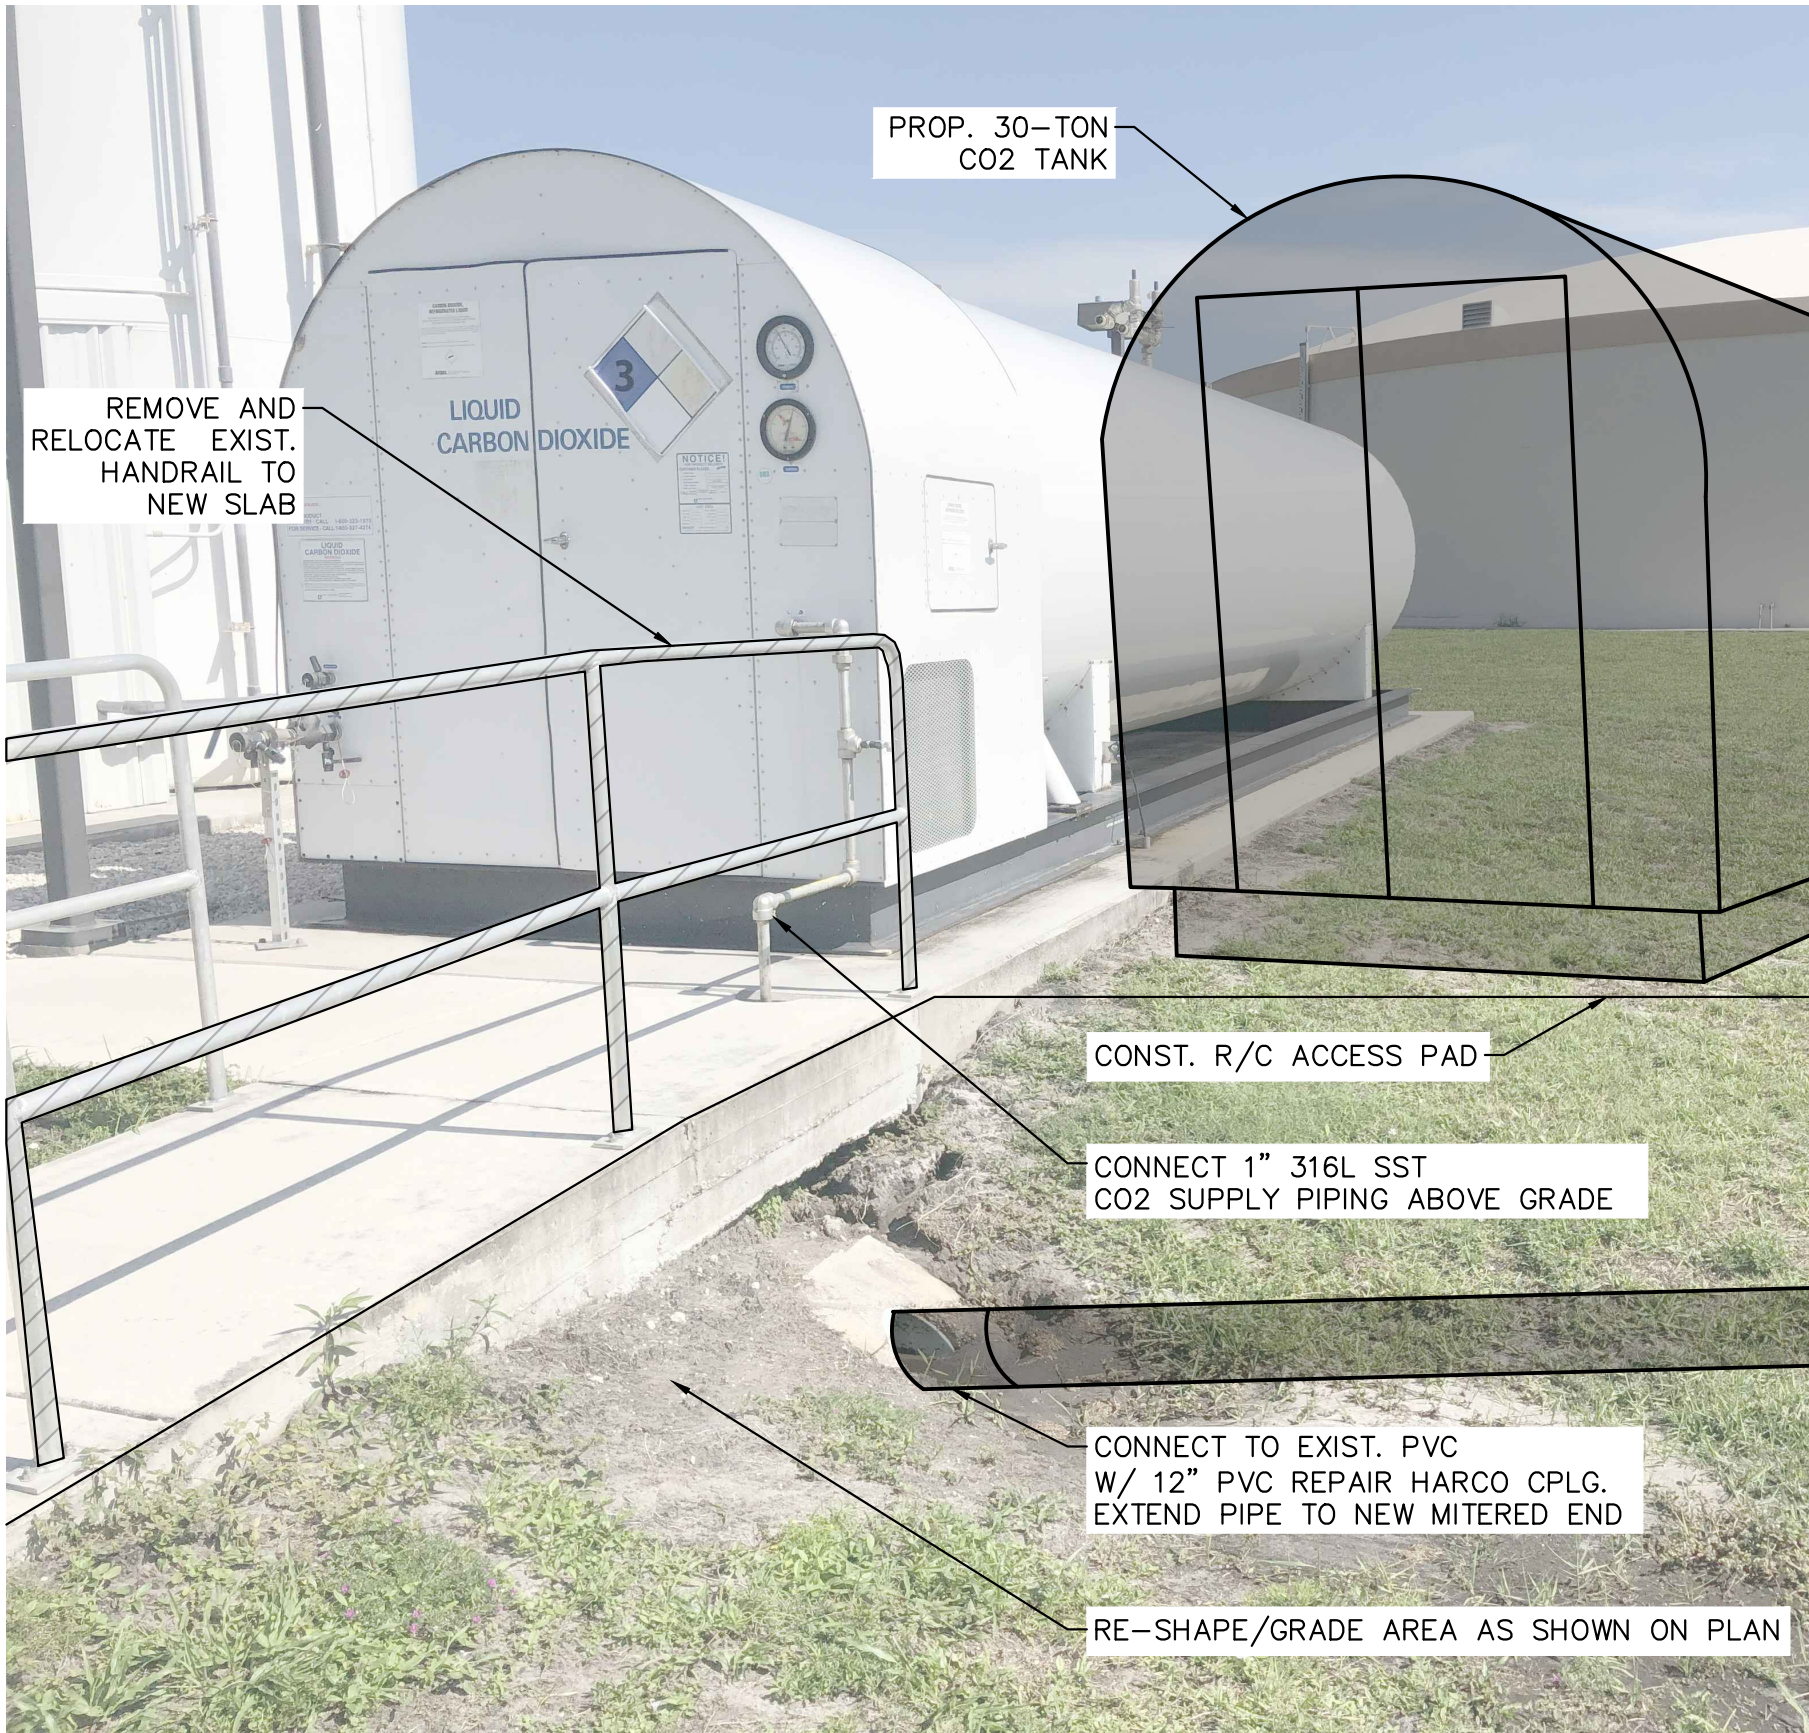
EXIST. CO2 TANK AND MITERED END DRAIN PIPE ☆
